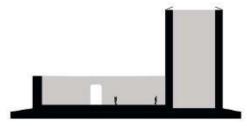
A section of the castle in model 1. Source:(Gemeente Teylingen, 2015)
